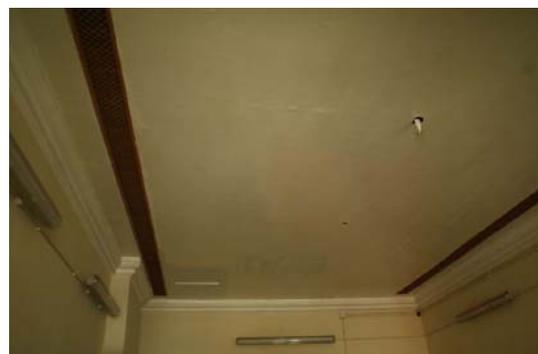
Timber panelled ceiling with linear ventilation grills (linear grills were later improvement works).
